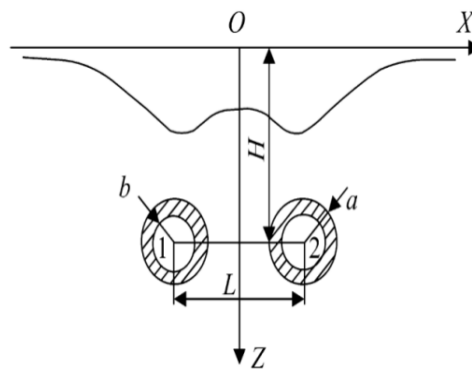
Schematic diagram of surface settlement of double-track tunnel cross-section
